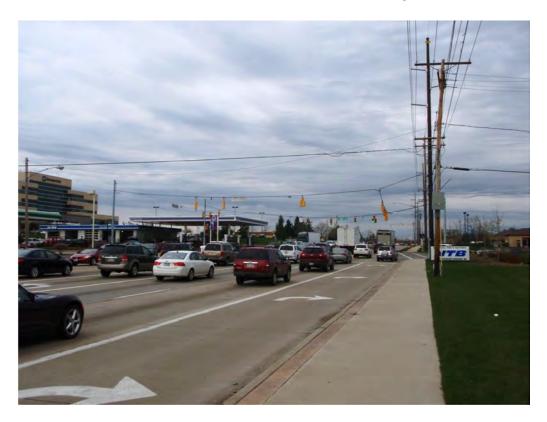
S.R. 82 and Howe Rd. north side, looking west
